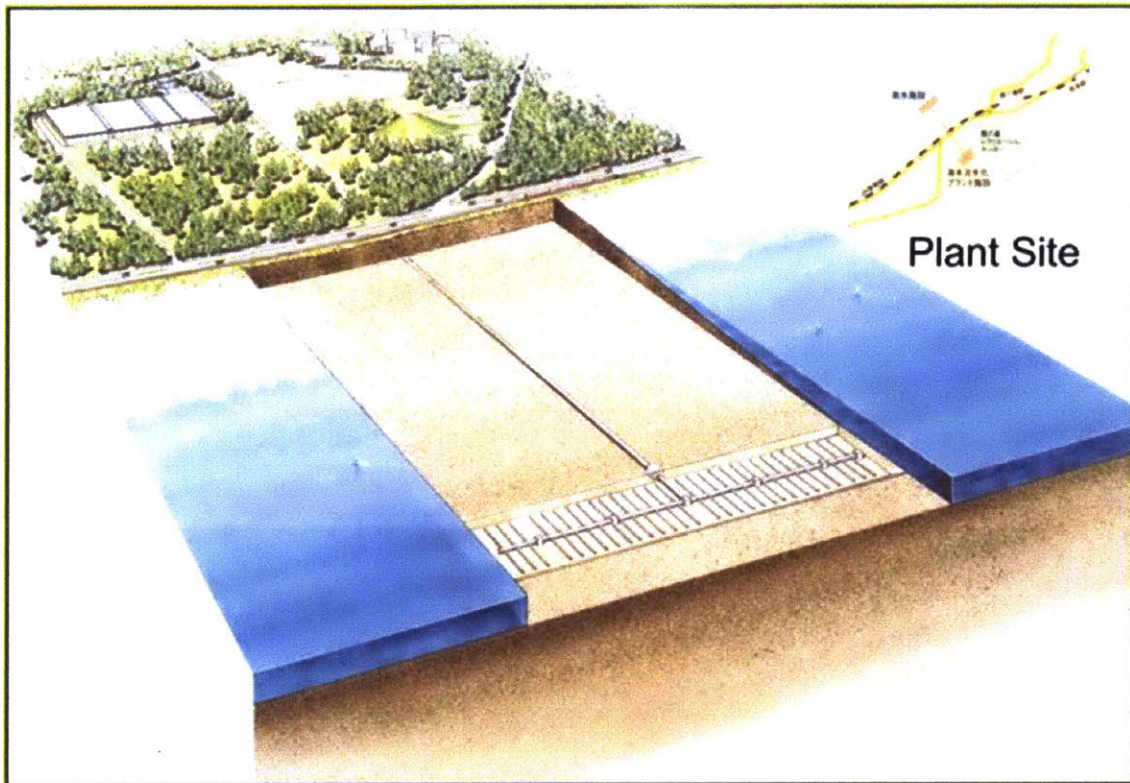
Plan view of the Fukuoka desalination plant[16]
